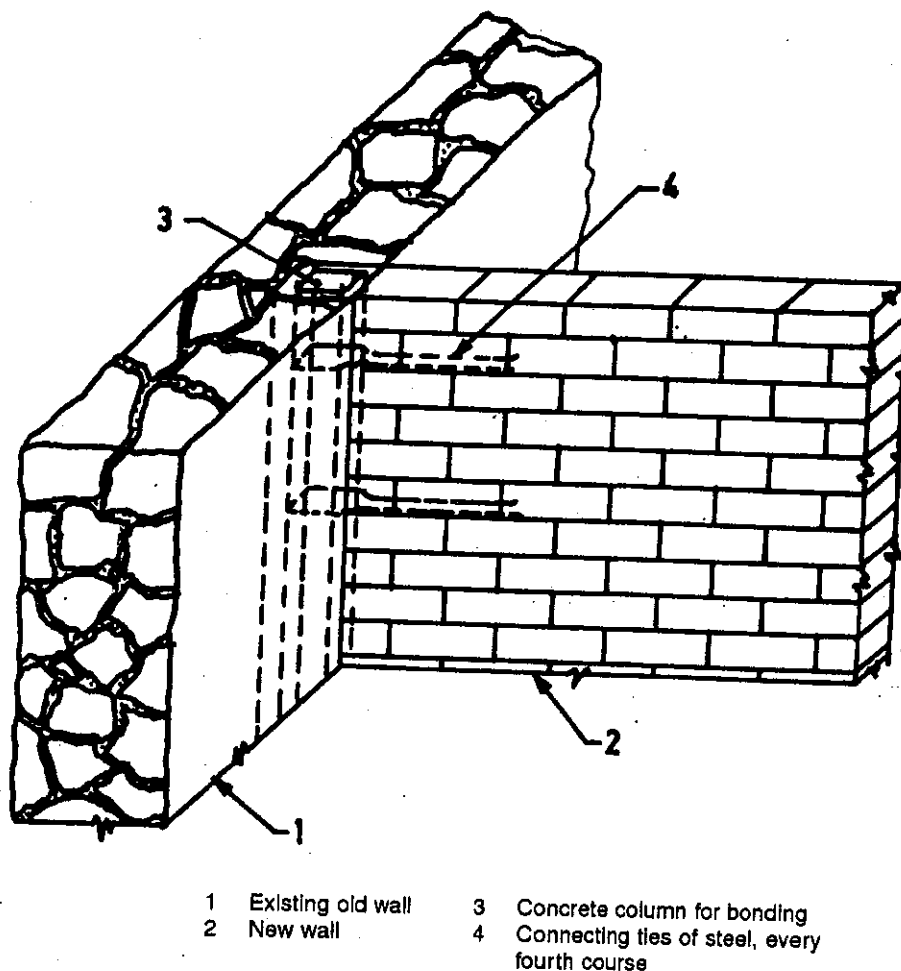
CONNECTION OF NEW BRICK WALL WITH EXISTING STONE WALLS
